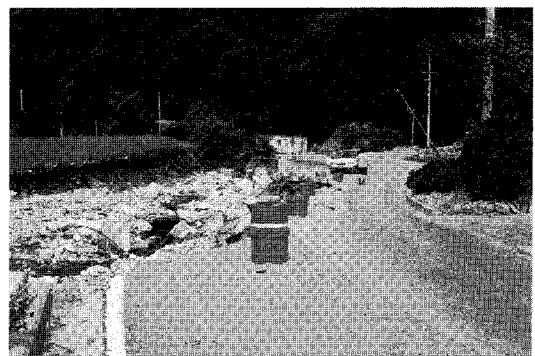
Damaged road (Inje, 2006). 파손된 도로.
